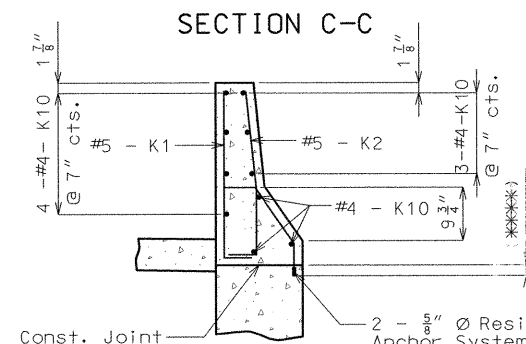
DETAILS OF LEFT SAFETY BARRIER CURB AT END BENTS
